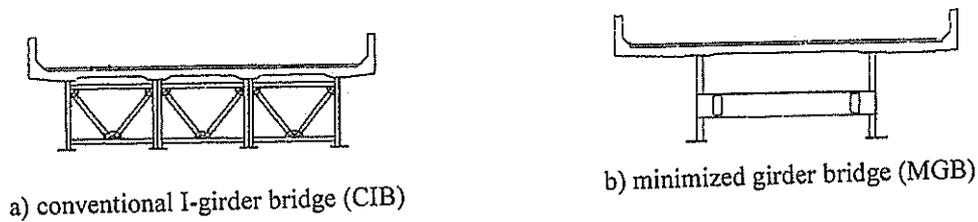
Conceptual Graphs of a Conventional I-girder Bridge and a Minimized Girder Bridge
